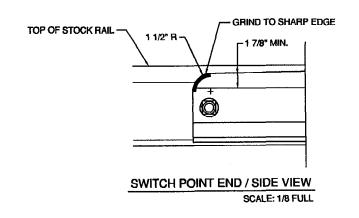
, SWITCH POINT PLANING & RAIL STOP
